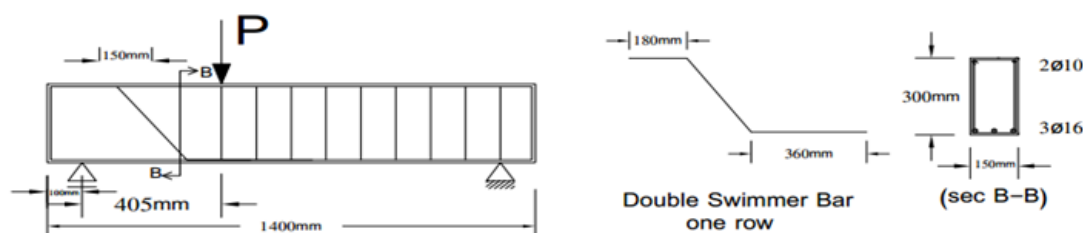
Cross Sec in beam with double swimmer bars in the cross-section
